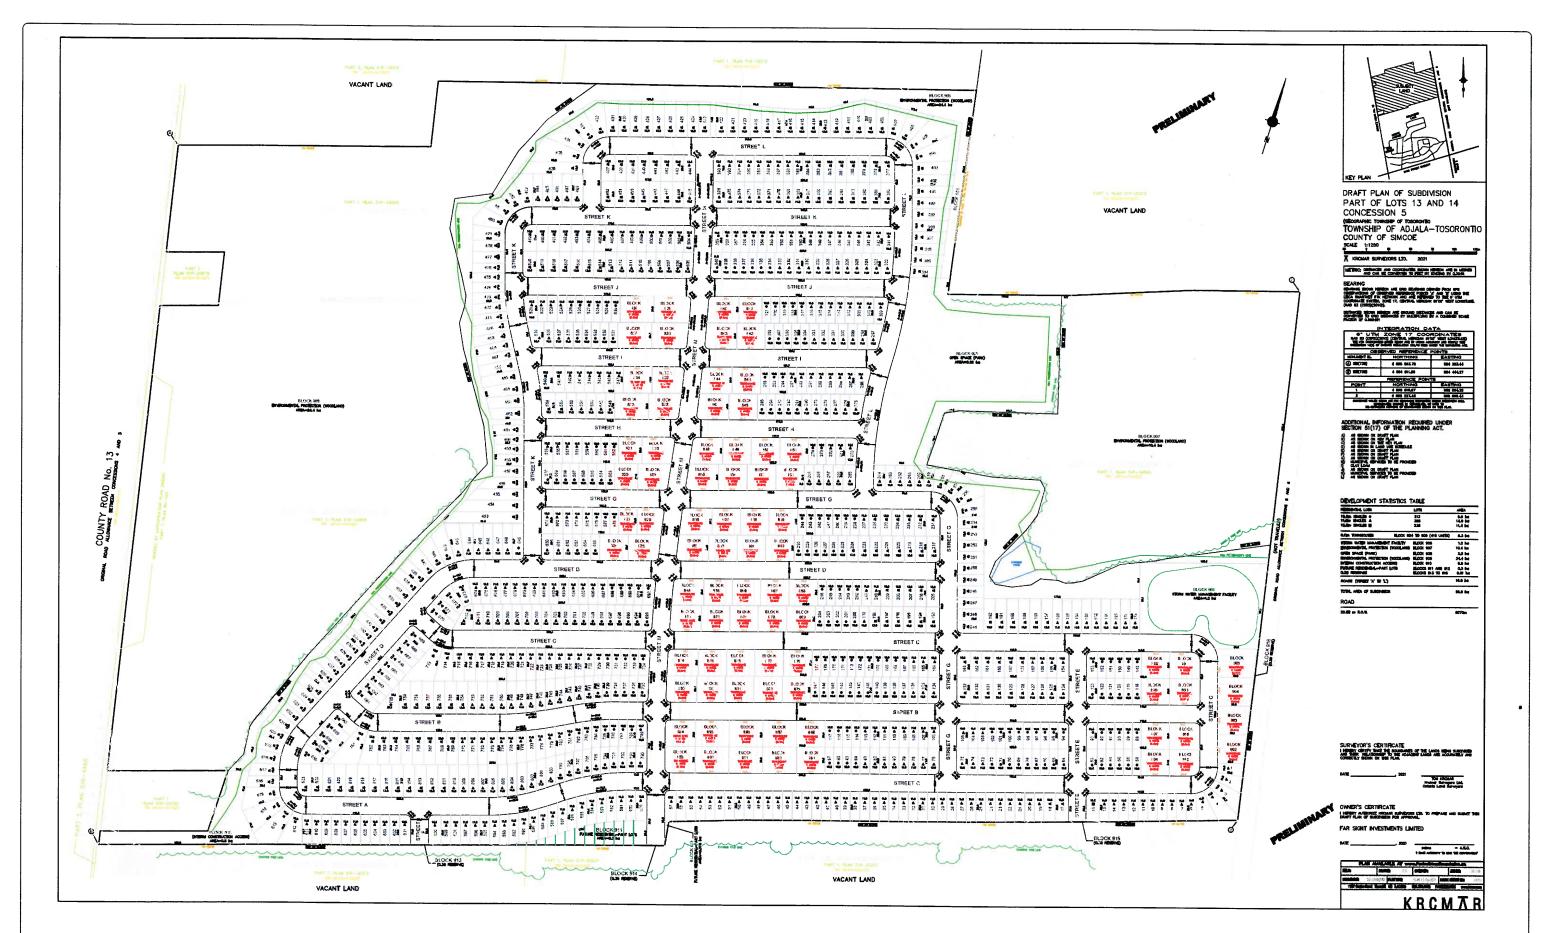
Far Sight Investments Plan of Subdivision Barzo Lands
